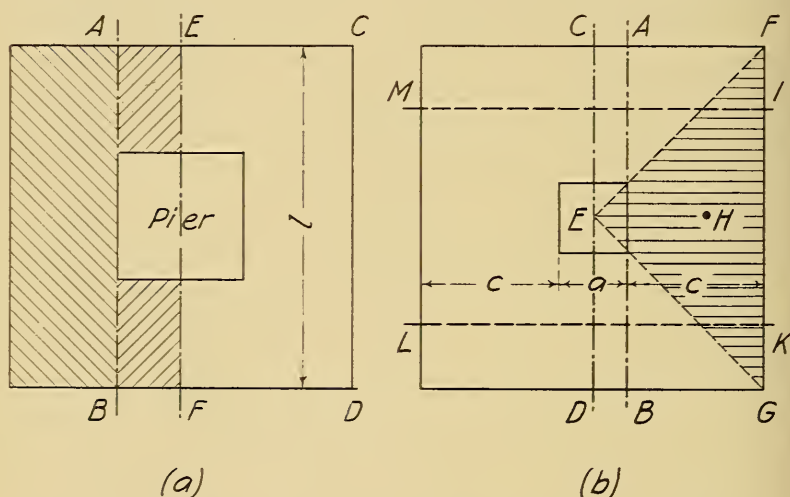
LOADED AREAS ASSUMED IN DESIGNING COLUMN FOOTINGS.
